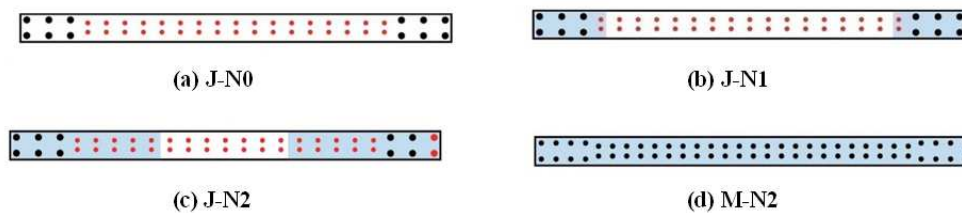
Location of Cut Bars and Damaged Area of Concrete
